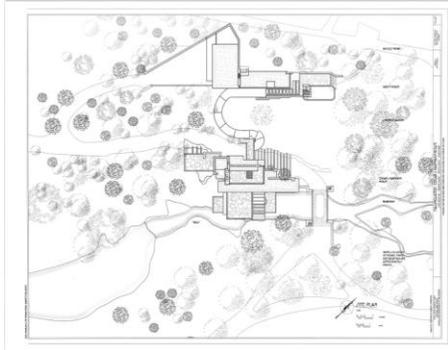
Plate VI: Falling waters site plan showing the position of the house on the water and vegetation and landscaping
